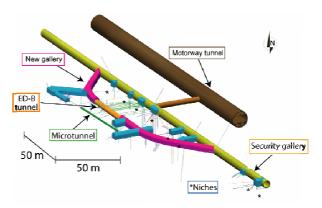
Layout of Mont Terri rock laboratory (from www.mont-terri.ch). Notice the ED-B tunnel within the New Gallery section.
